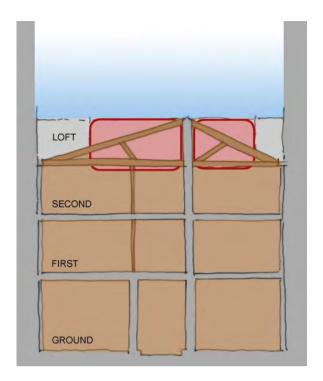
Concept diagram showing loft addition within second floor between roof trusses and below parapet. NBRS+Partners, 2015.
